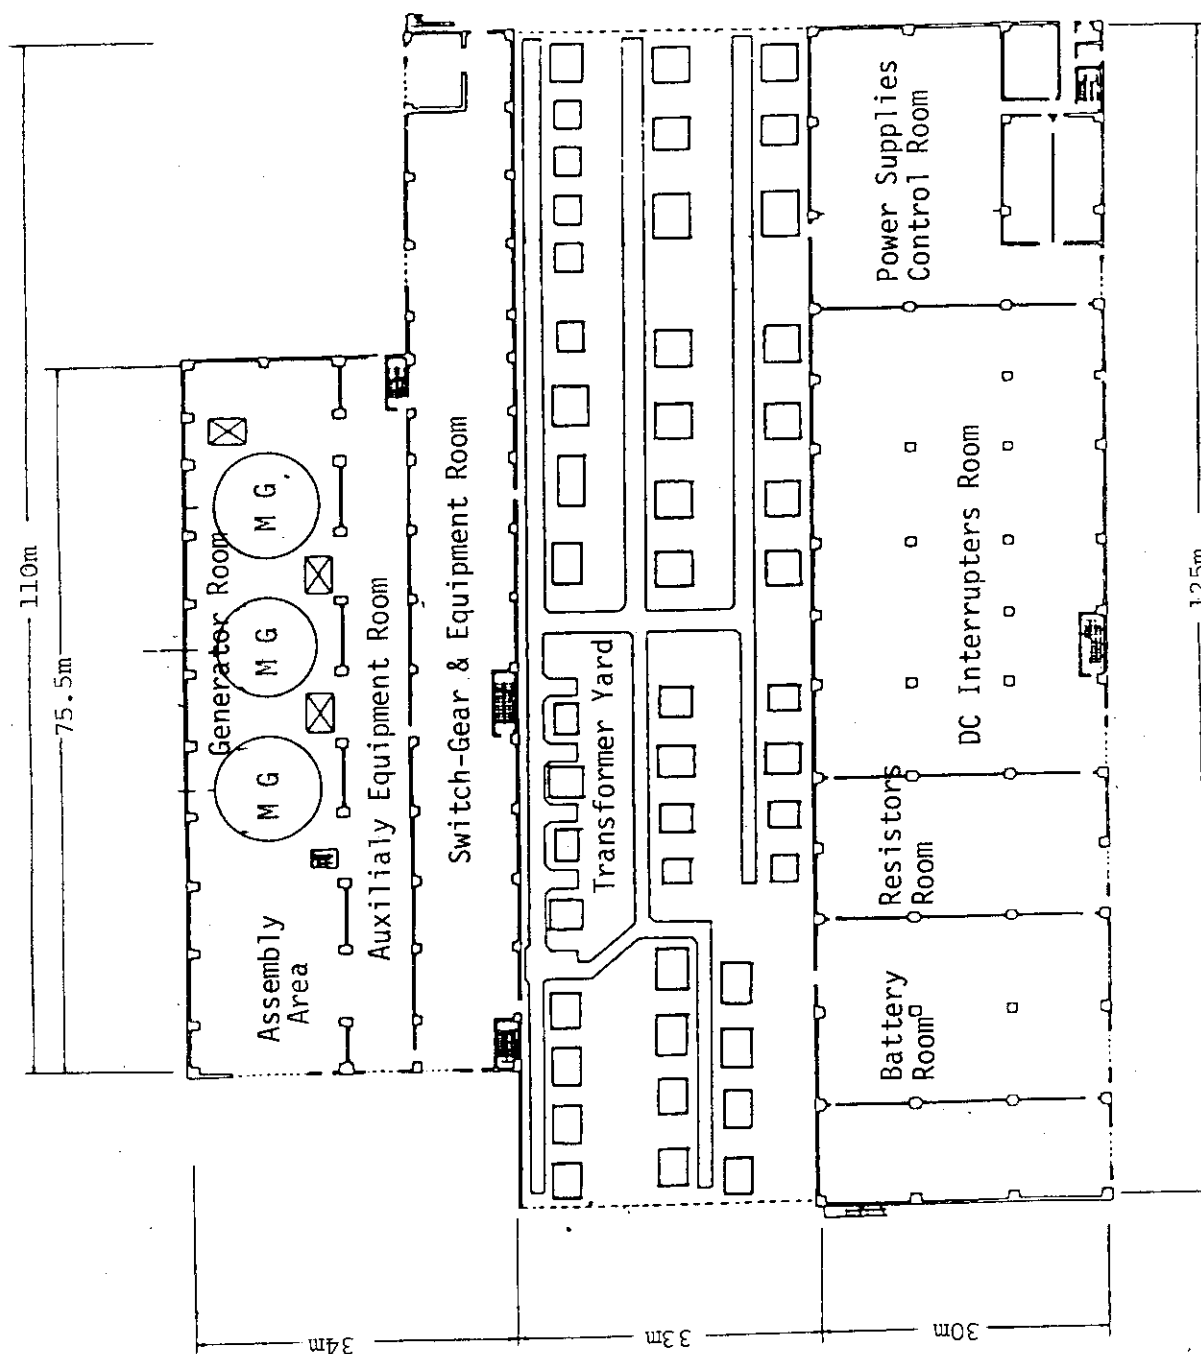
JT-60 Power Supplies Building 1F plan
